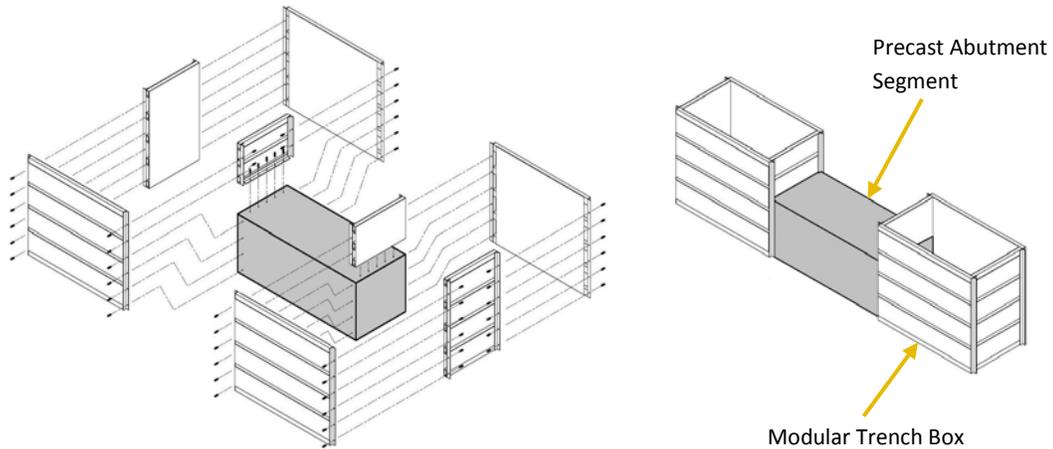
Precast Assembly: precast segment joined to two modular trench boxes
